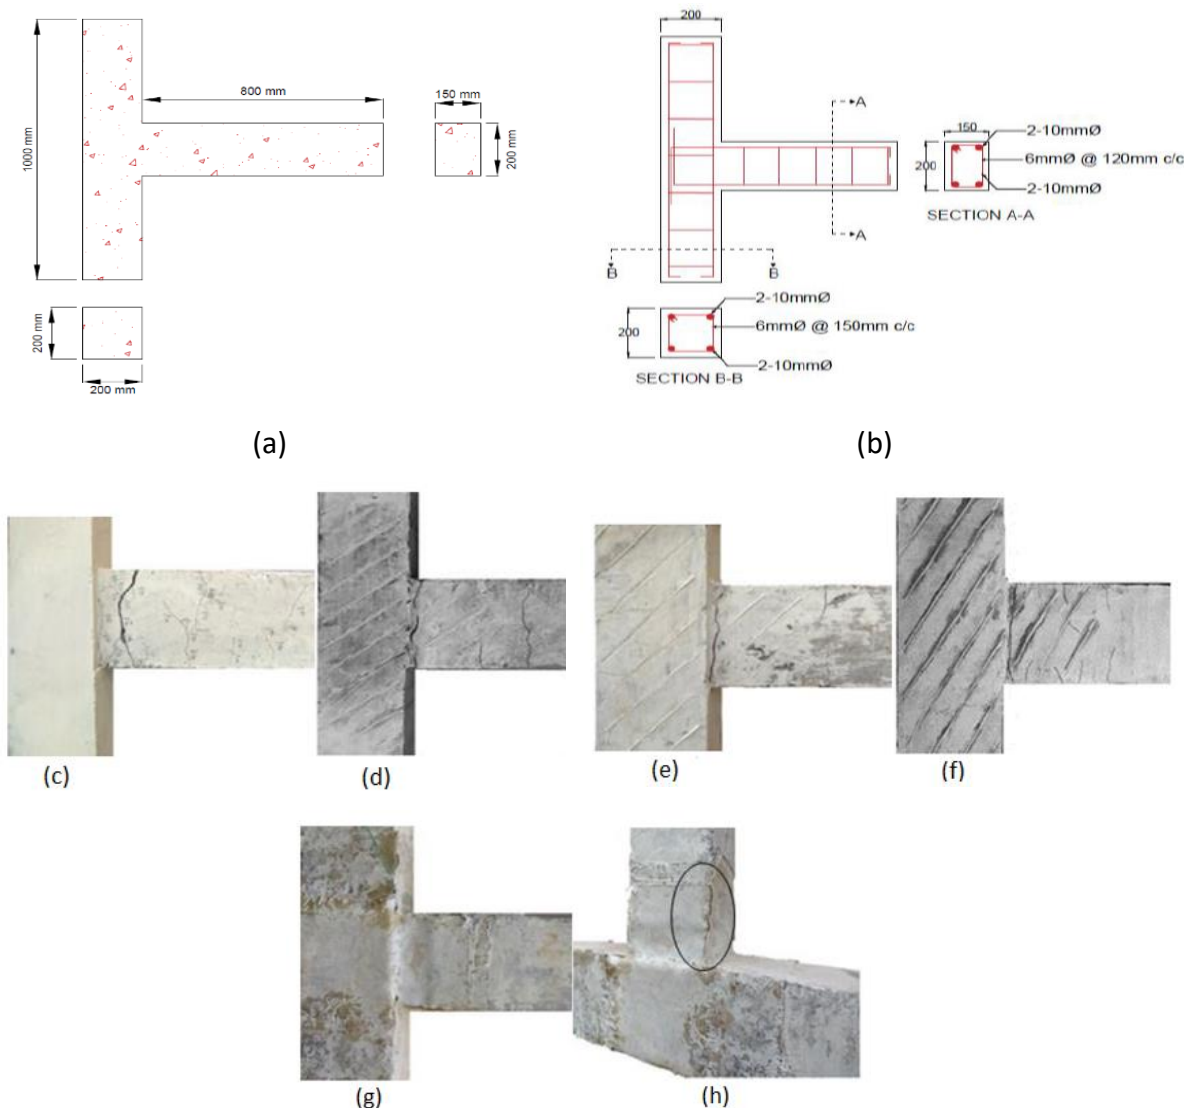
(a) Dimensions of the beam-column joint specimen; (b) Reinforcement details of the specimen; (c) Crack pattern of BCJC specimen; (d) BCJN30 specimen; (e) BCJN45 specimen; (f) BCJN60 specimen; (g) BCJEB specimen; (h) Delamination of BCJEB specimen (Akash and Jayasree, 2018).
